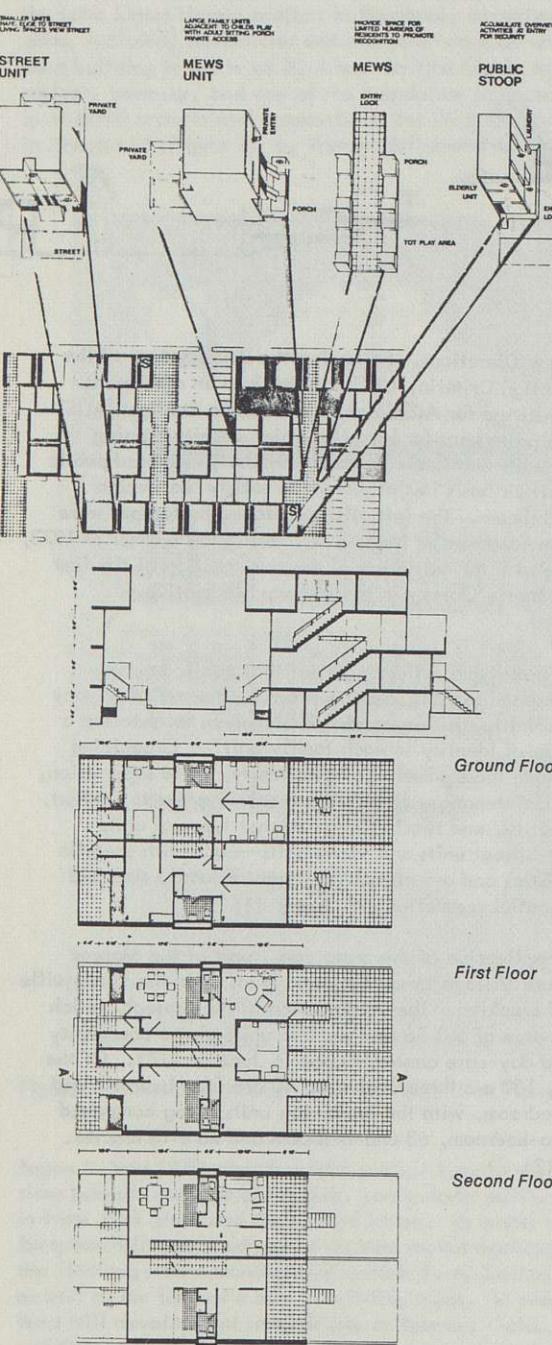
IAUS Prototypes: Plans and Sections/Elevations.
